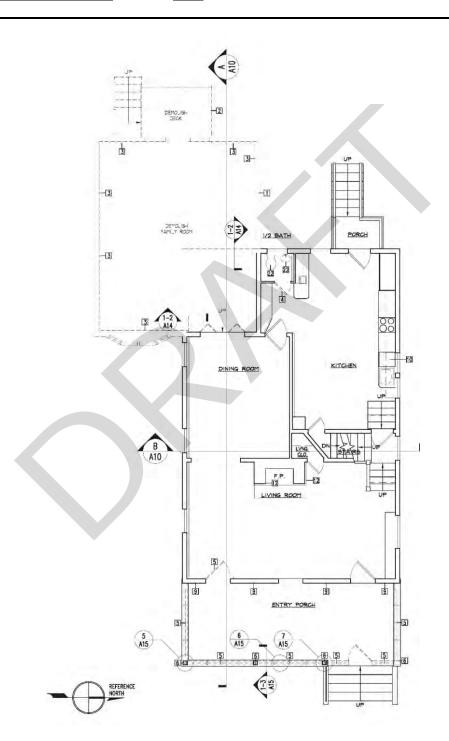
First Floor Plan prior to restoration (a. 2010). Note enclosed porch, door openings from living room onto porch, and family room addition at southwest corner. (Detail, Drawing A3, Gensler 2011)
